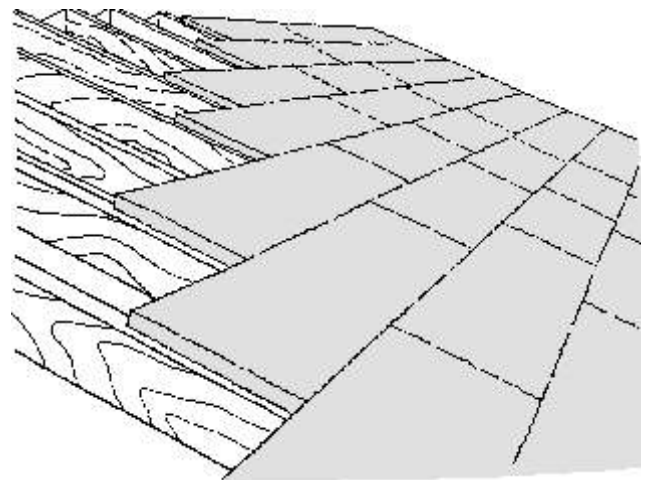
Nailing woodwool slabs to the rafters on a pitched roof.
